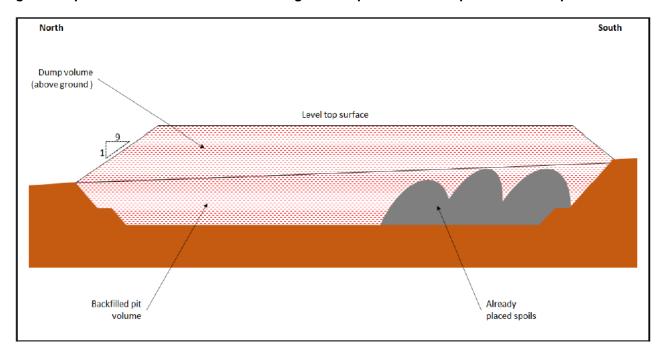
Option 2b schematic section showing discard placement as pit backfill and aboveground
